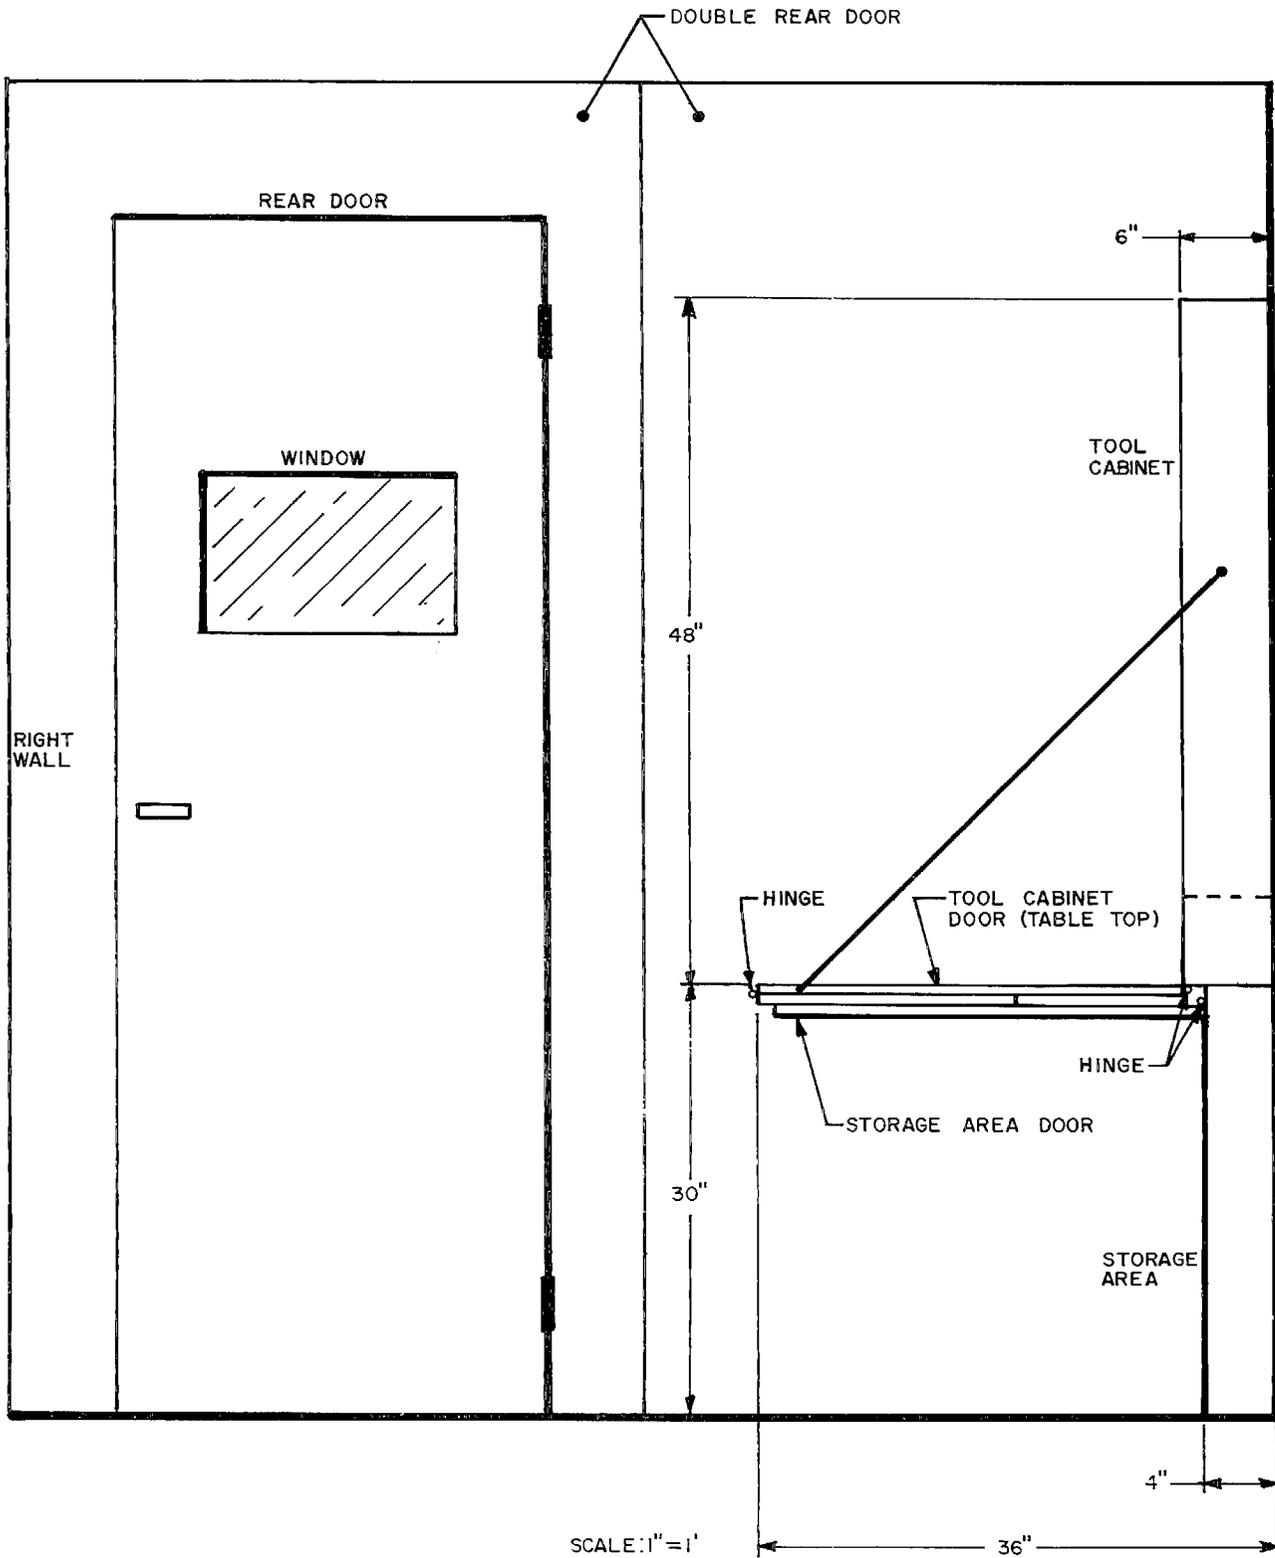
Tool Cabinet and Rear Door (Section J-J of floor plan)
